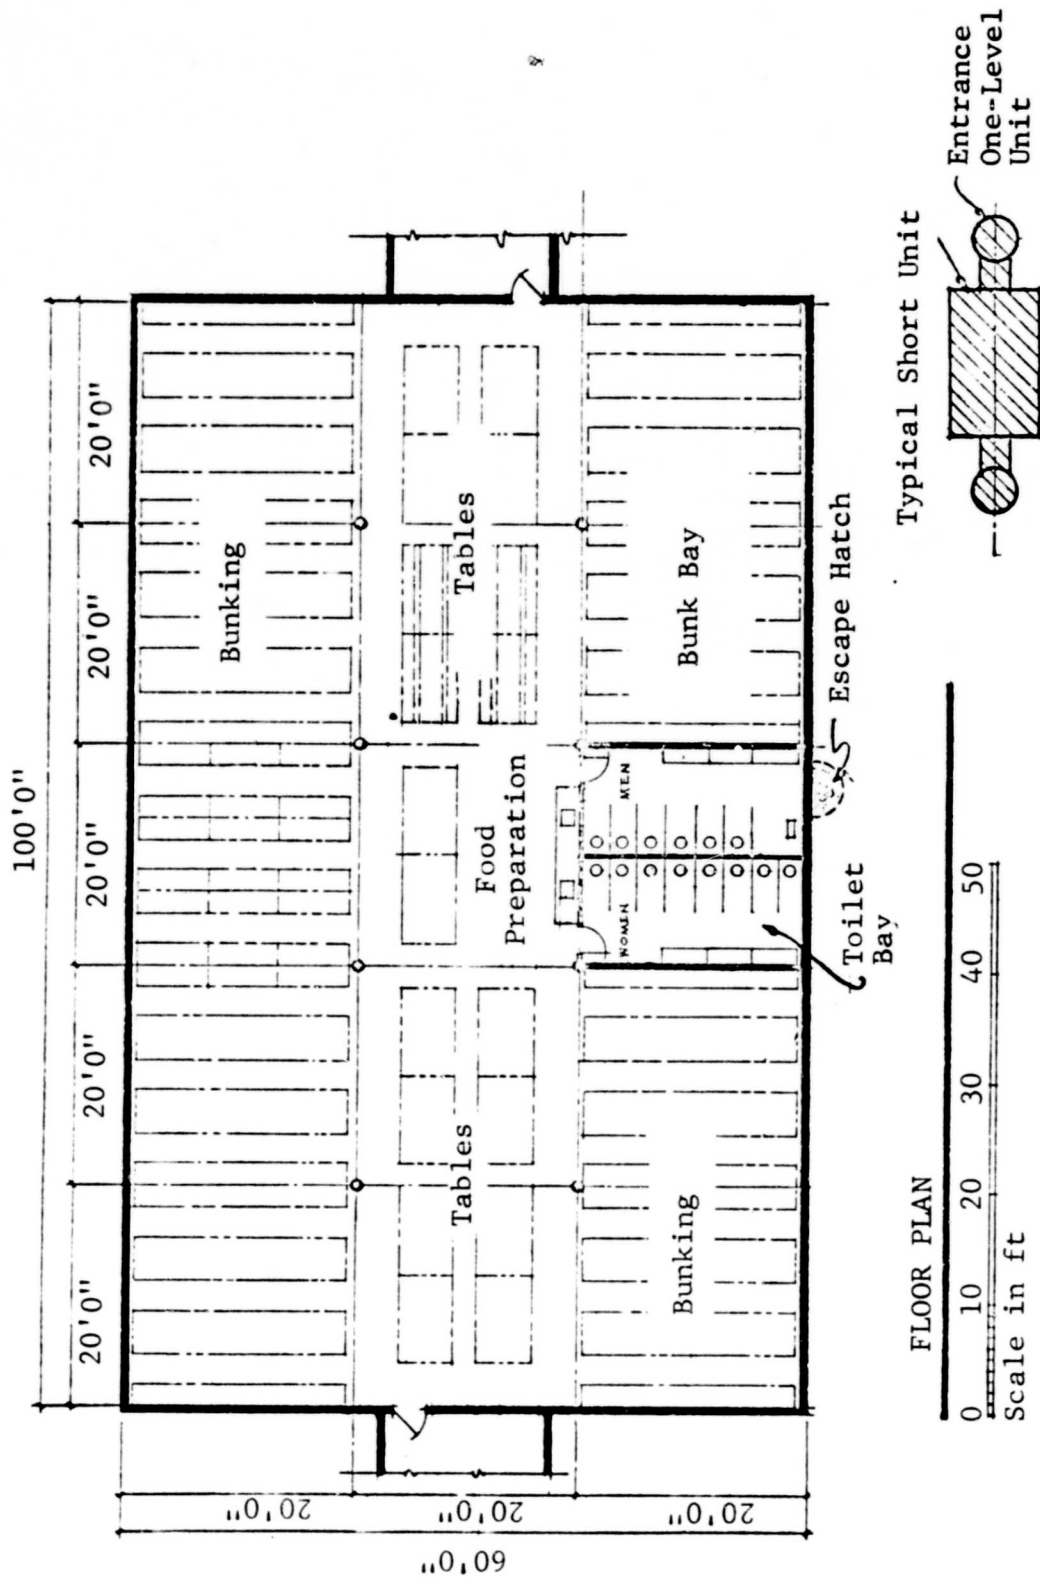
TYPICAL "SHORT" SHELTER UNIT, COMMUNITY FALLOUT SHELTERS FOR THE COUNTY OF LOS ANGELES
